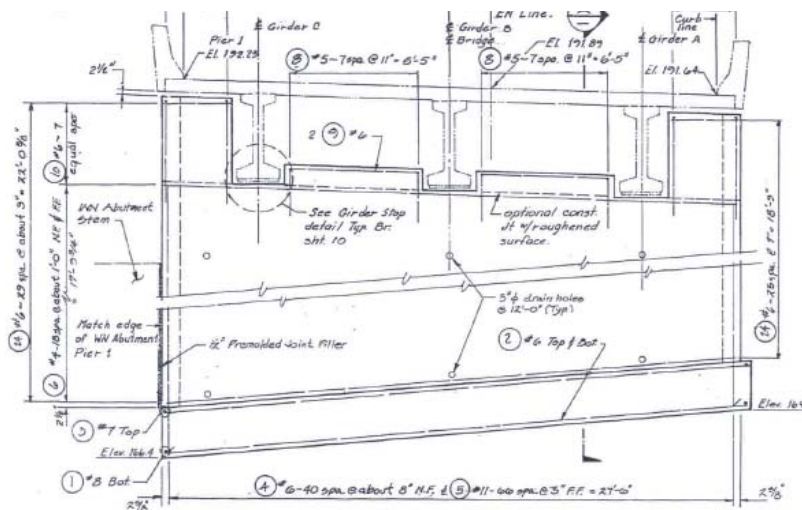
Bridge 520 West Abutment and Deck Elevation View
